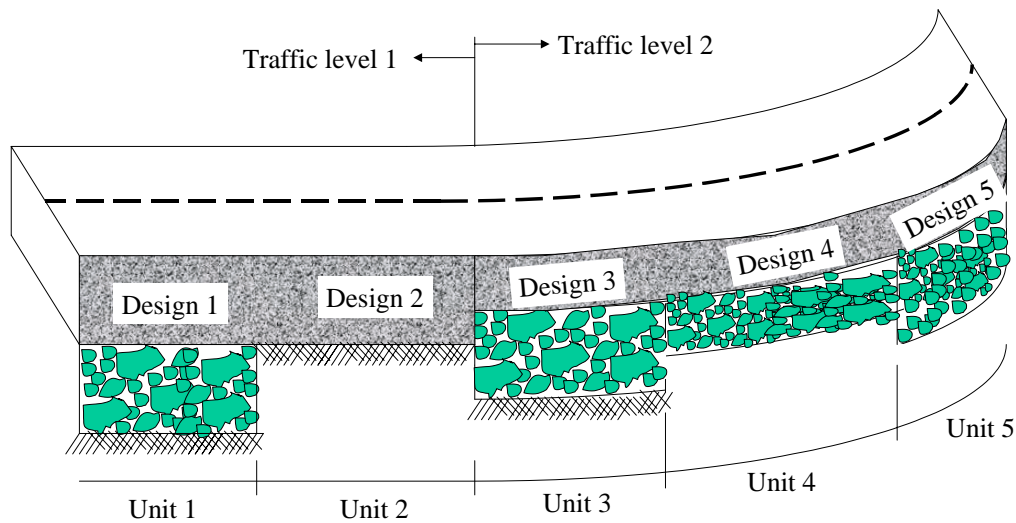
Example of pavement project segmented into five units with similar properties for evaluation.
